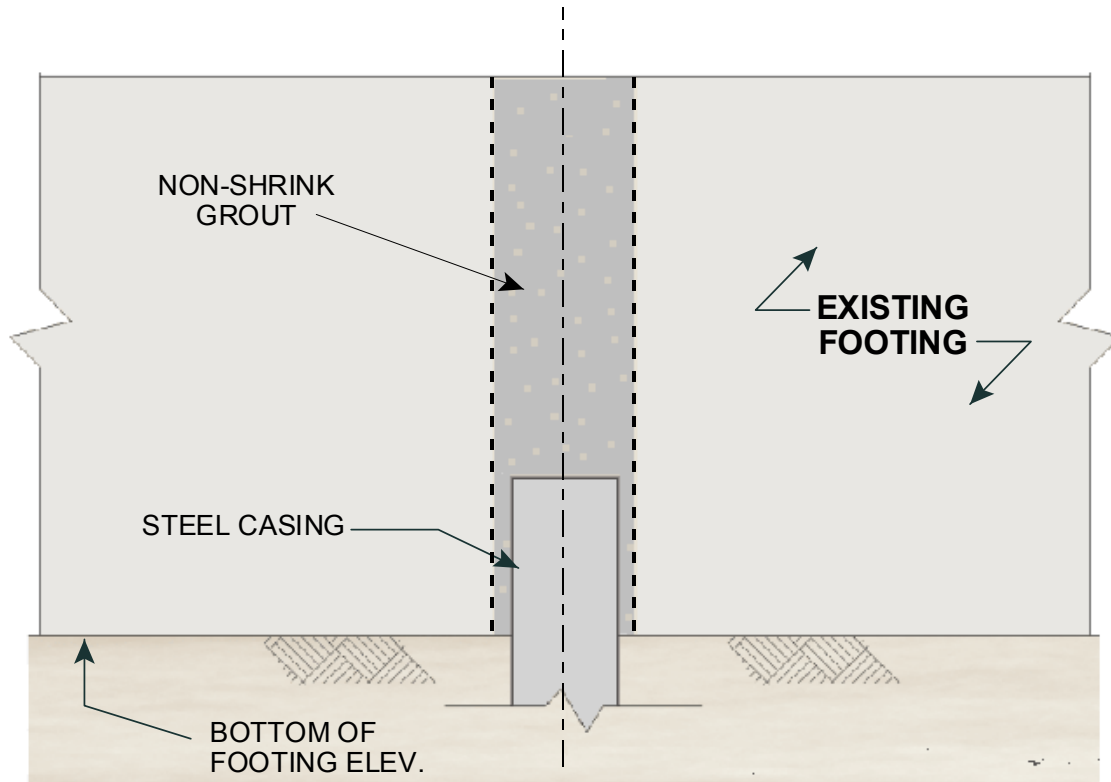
Pile to Existing Footing Connection Detail (compression loads).
